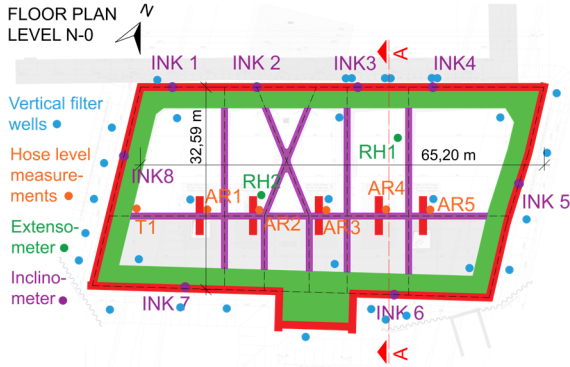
Floor plan level N-0 (Kostadinovic, 2023).
